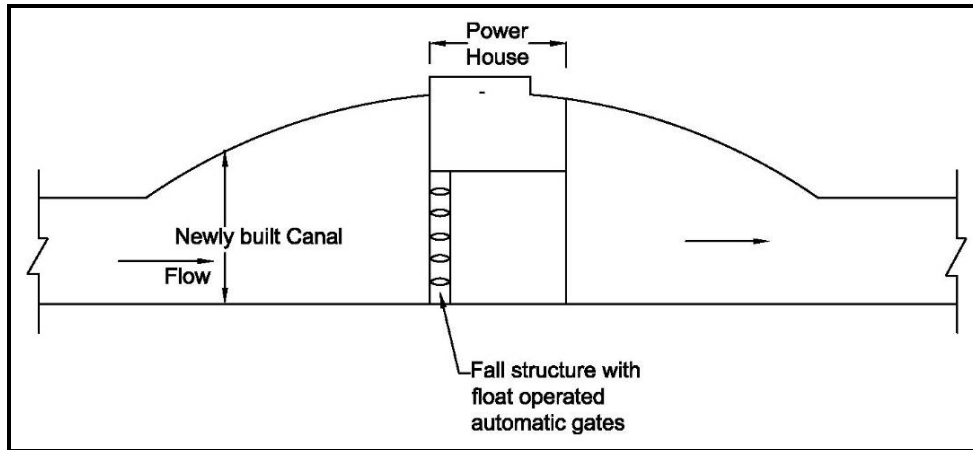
Typical Layout Plan of Power House on Existing Canal
